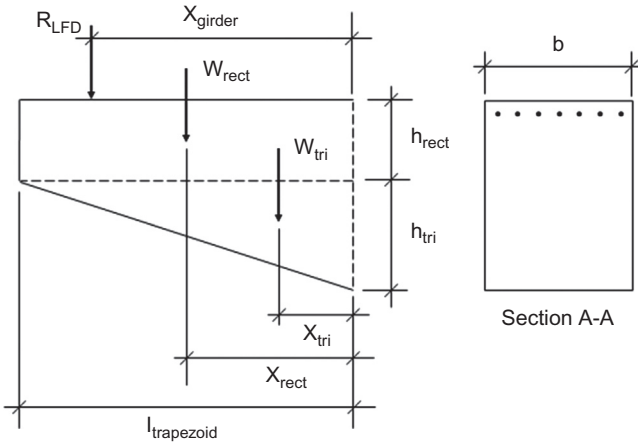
Loads on the trapezoidal sections of a hammerhead pier.
